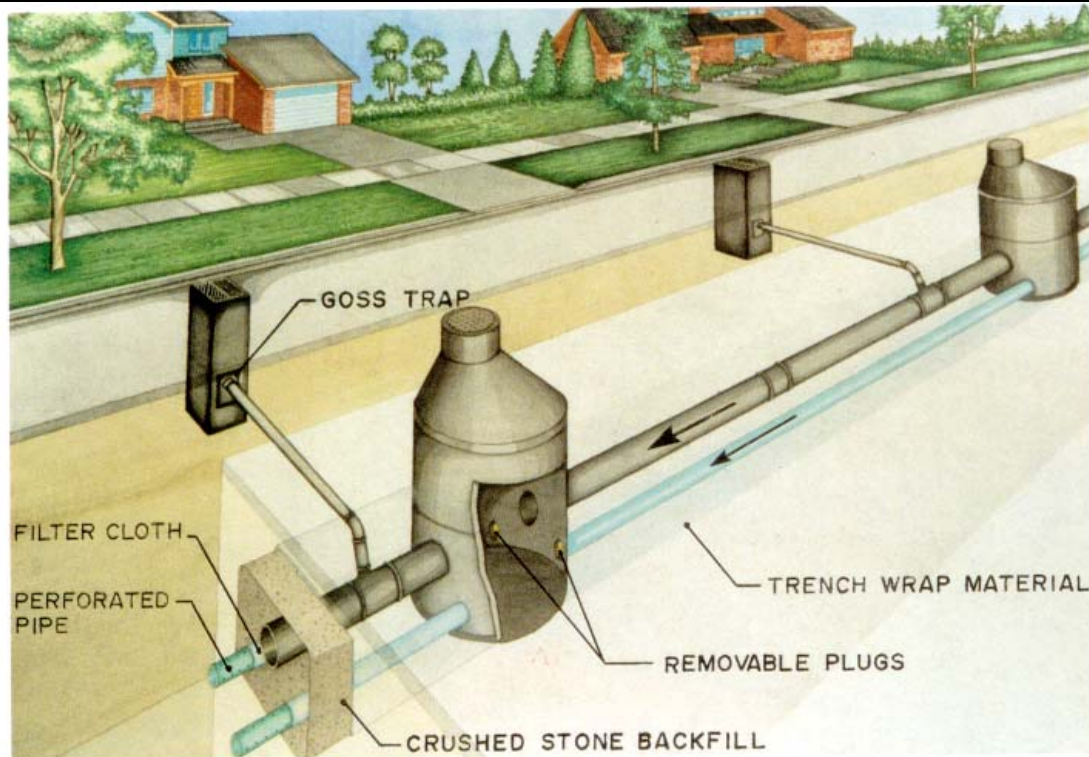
Typical curb & gutter drainage system with catchbasins and exfiltration trenches
